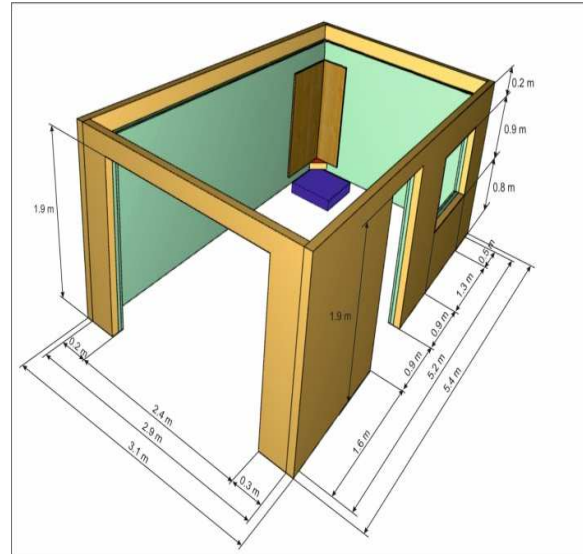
Schematic representation of the test room with the highlight of the ventilation openings dimensions (doors and windows)
